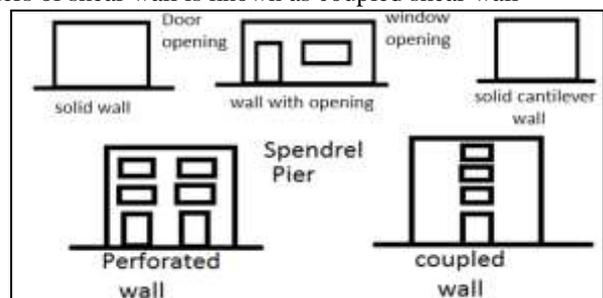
Shear Walls- Solid, with Opening, Coupled
